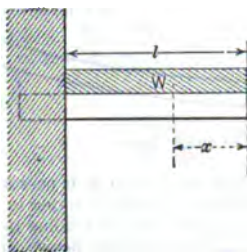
Cantilever Beam. Uniformly Distributed Load
